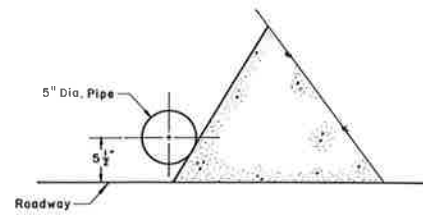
Low concrete bridge rail design with top rail lacking sufficient strength to retain impacting vehicle.
